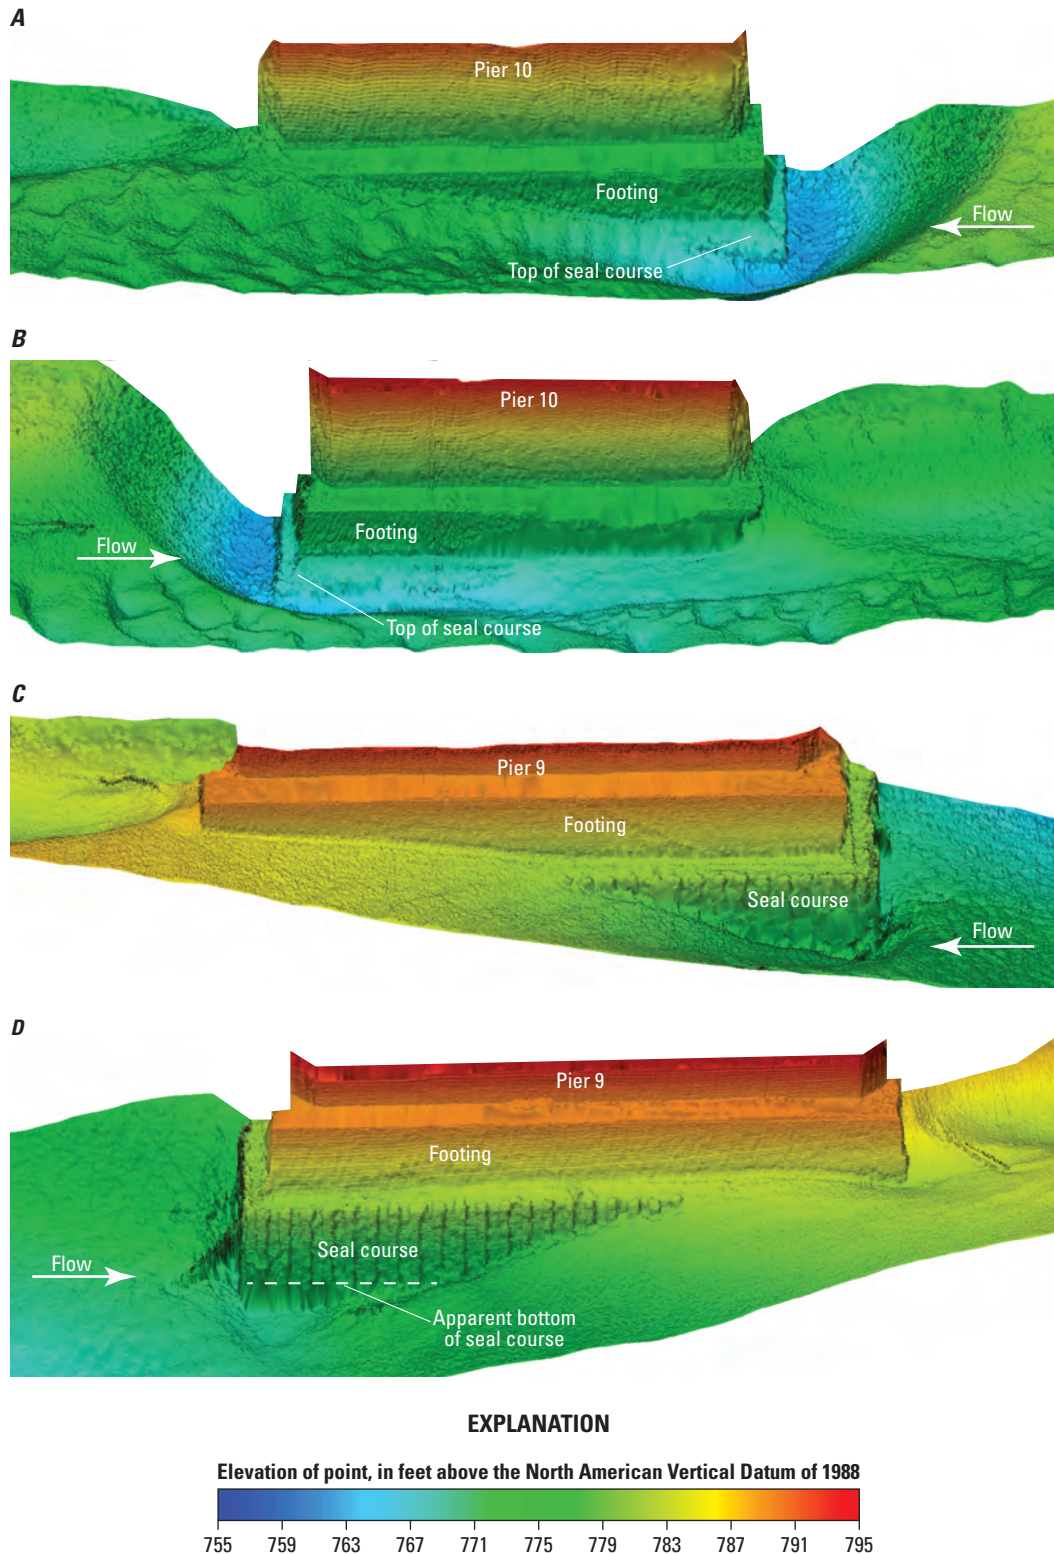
Shaded triangulated irregular network visualization of the channel bed and piers of dual bridge structure A3664 on U.S. Highway 36 over the Missouri River at St. Joseph, Missouri. *A*, Left (east) side of pier 10. *B*, Right (west) side of pier 10. *C*, Left (east) side of pier 9. *D*, Right (west) side of pier 9. (Note: point cloud data for pier 8 were too sparse to create a visualization).
